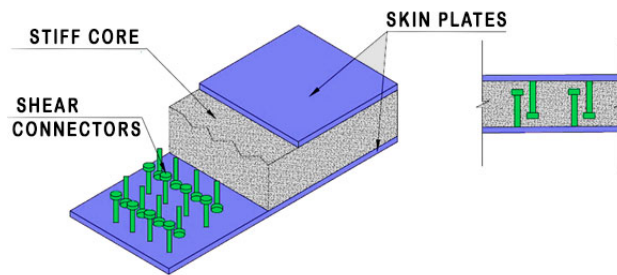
Steel-Concrete-Steel (SCS) sandwich structure with shear headed stud connectors
